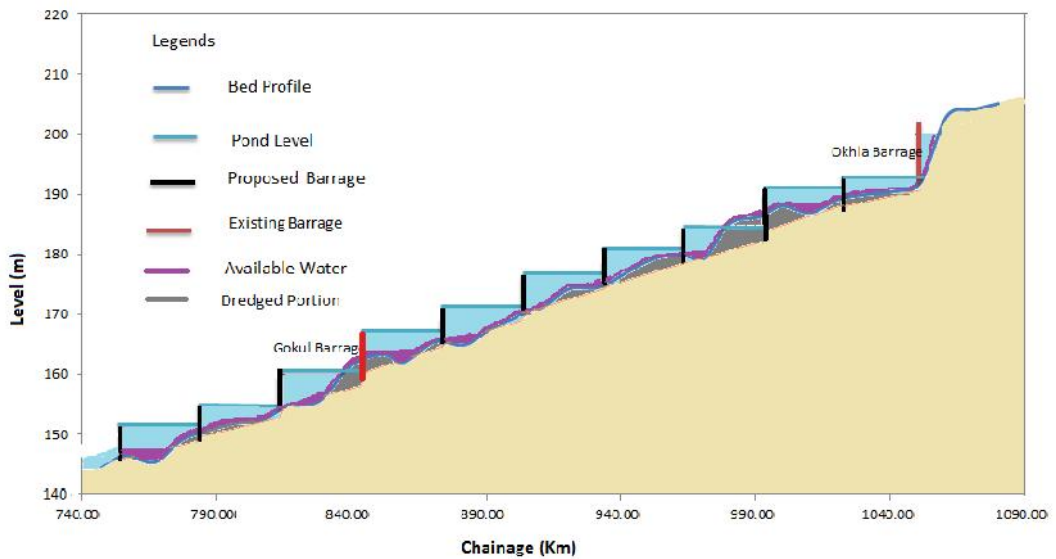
Barrage Location for Stretch-4 (Ch. 743 km to Ch. 1081 km)
